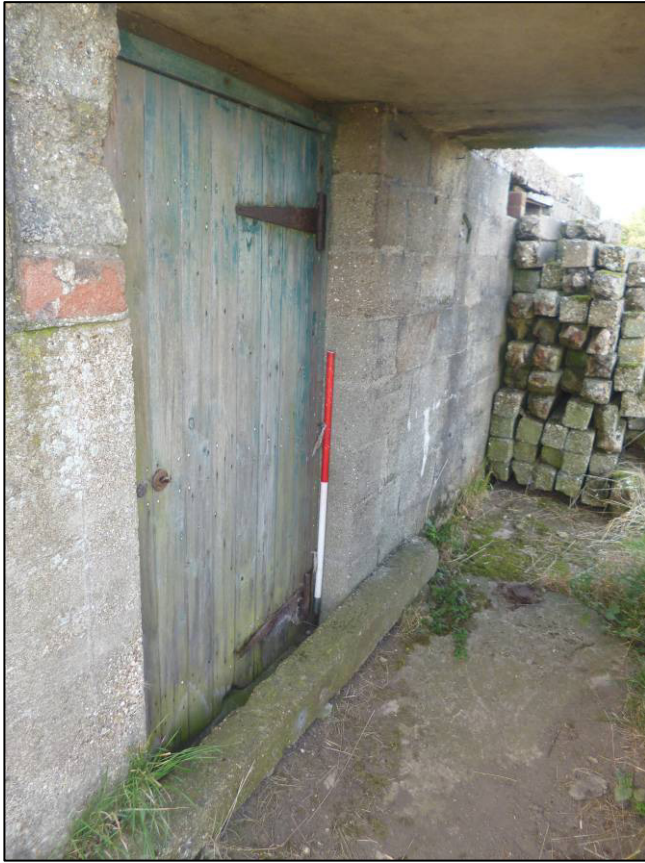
Structure B (command post), north elevation, Room 3 door, looking SW (photo 2/163).
